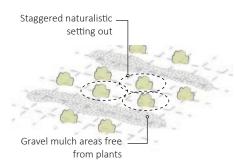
Diagram illustrating typical staggered layout of trees and shrubs along roads
